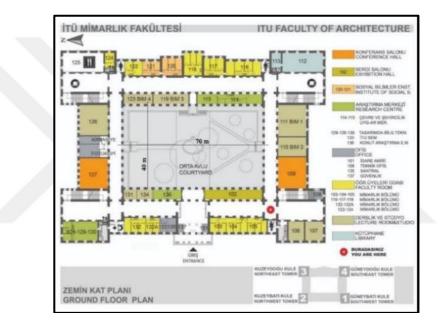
İstanbul Technical University, Taşkışla Campus floor plan [91]
